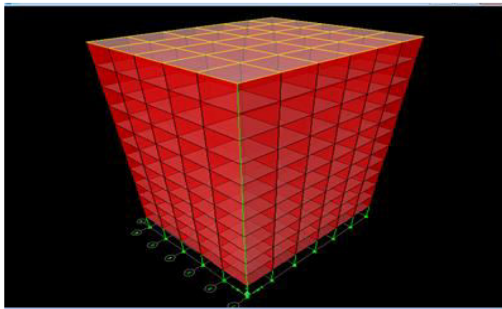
Elevation of twelve storeyed Building Model 2 (ground soft)
